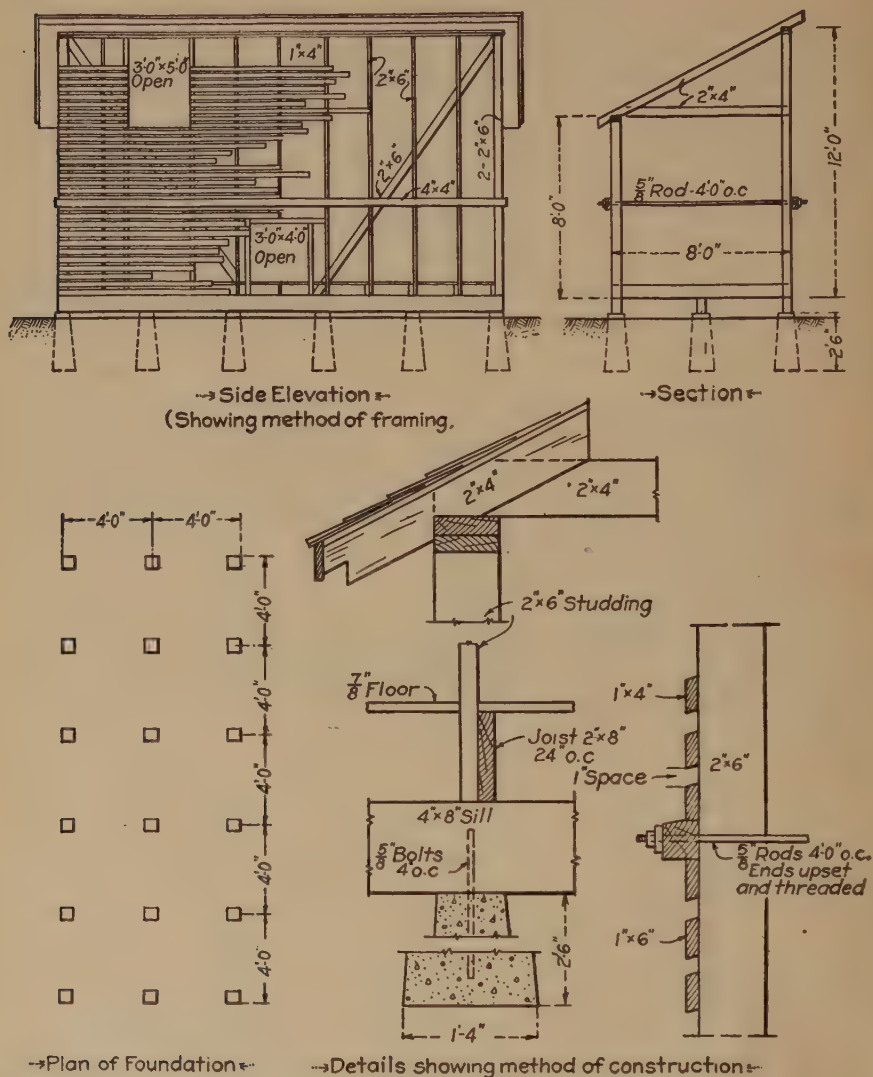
Details of small Corn Crib. Piers take the place of foundation walls. Doors for filling and emptying may be located as desired; the four lowest boards may be nailed on cleats and hinged to open outward and upward, for emptying into a dragbelt along the wall. Plain boards or beveled siding may be used for walls.
